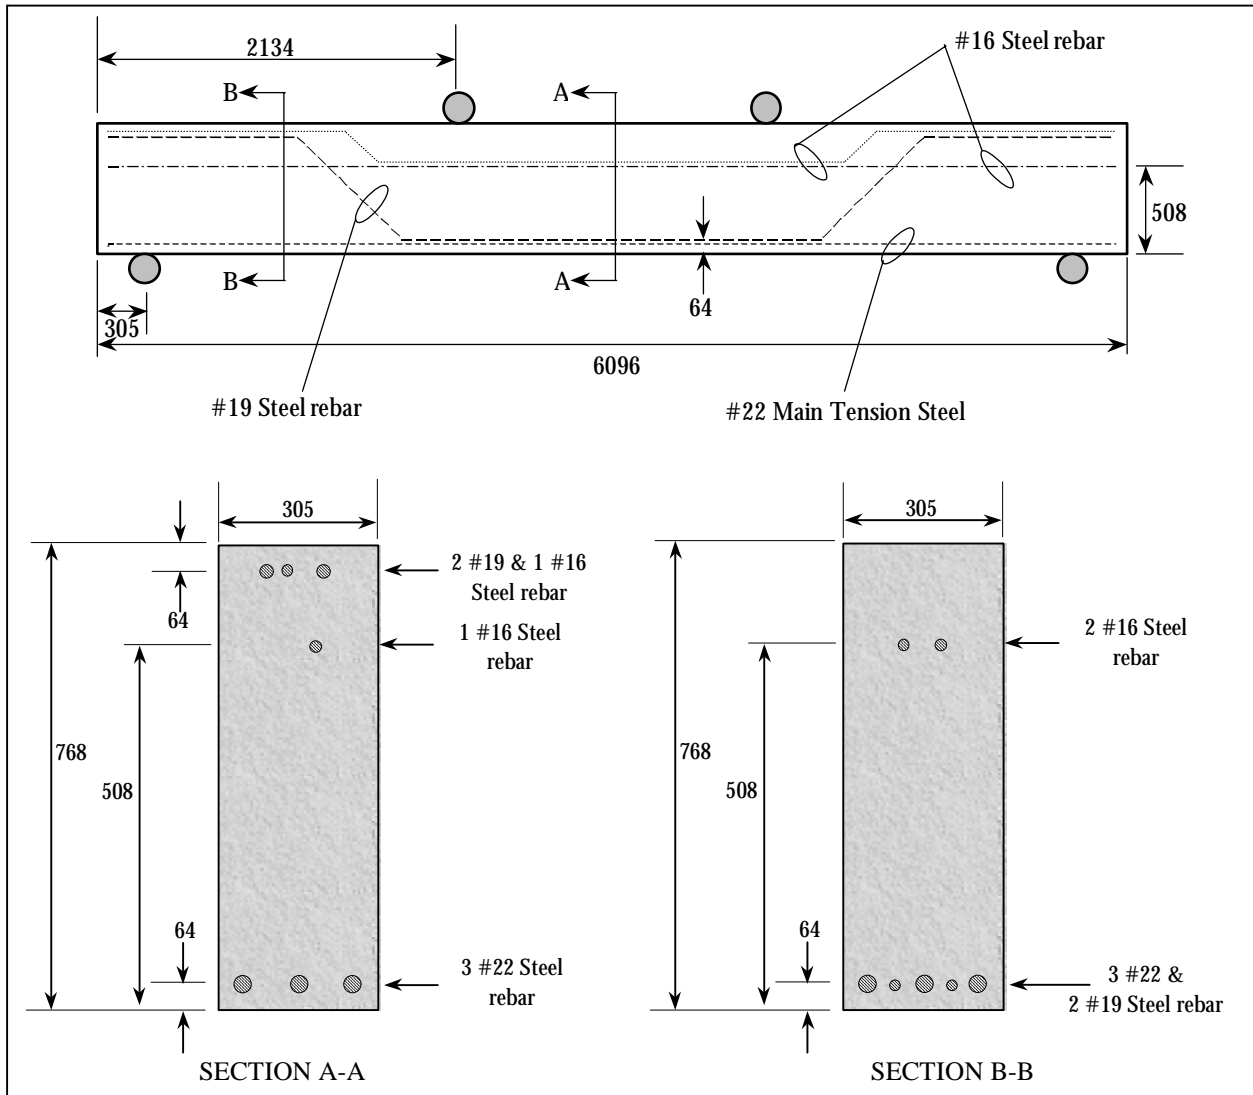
Position of steel reinforcement in all beams. Dimensions and rebar sizes are in mm.
